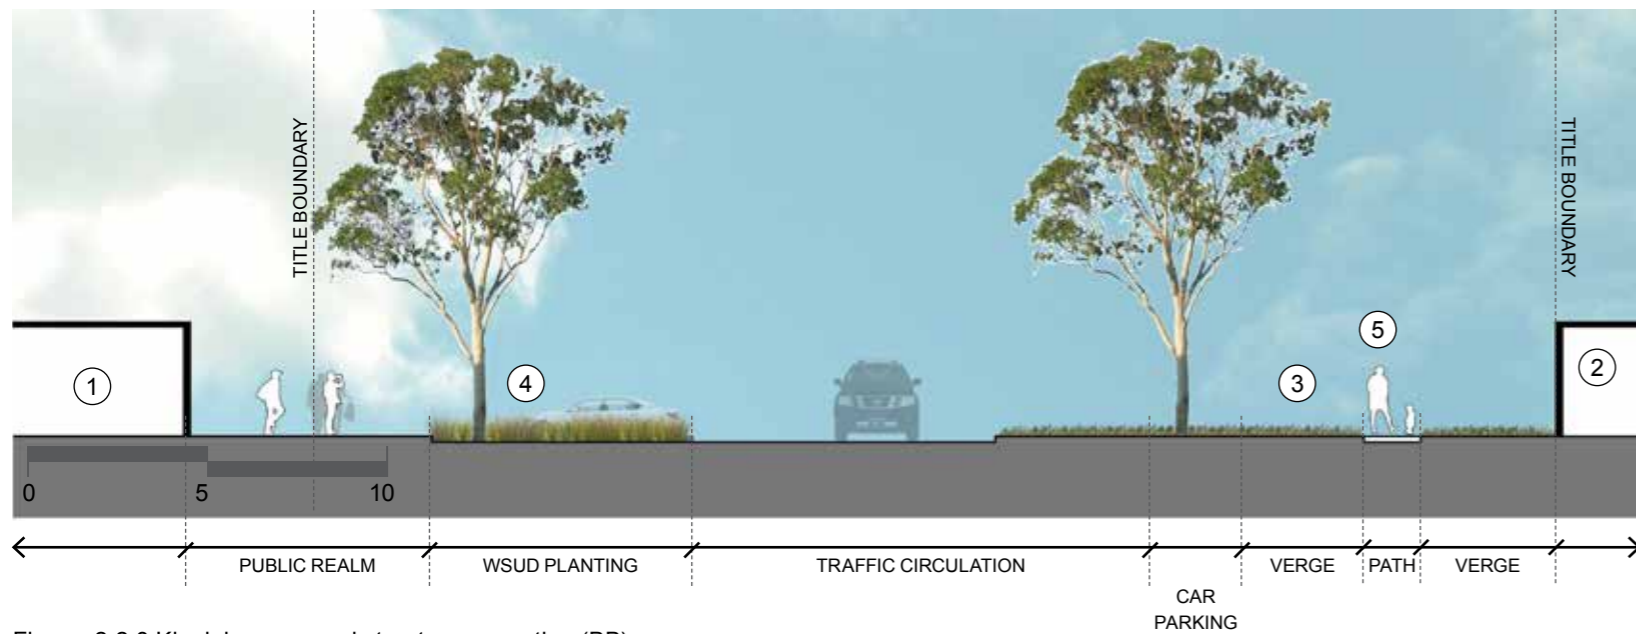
Kinglake proposed streetscape section (BB)
